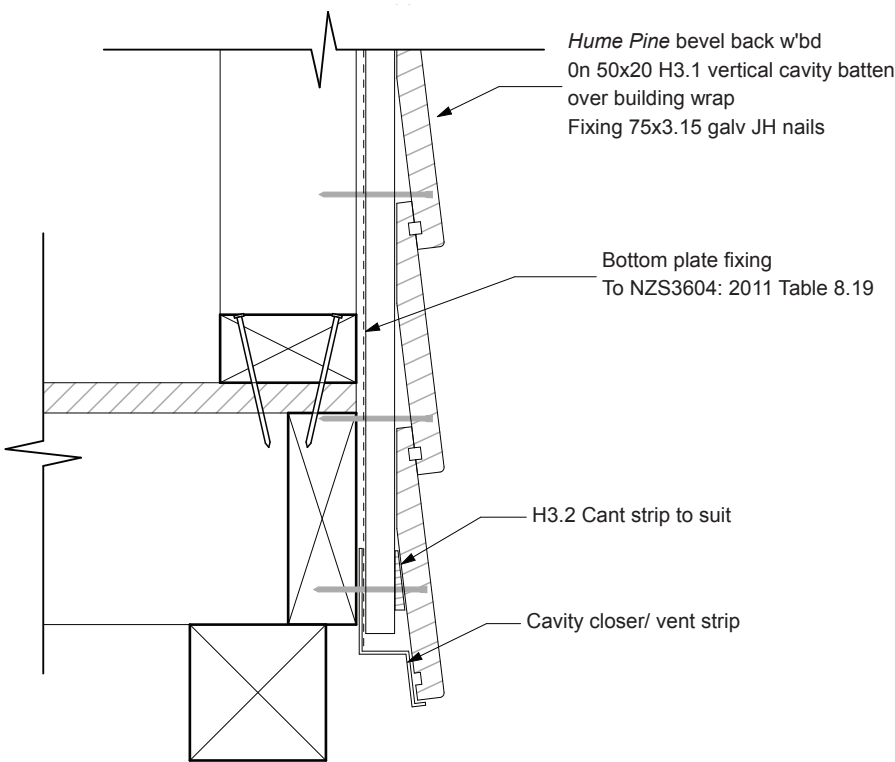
Bevel Back Cavity Fix Foundation Conc Floor | Scale 1:5
